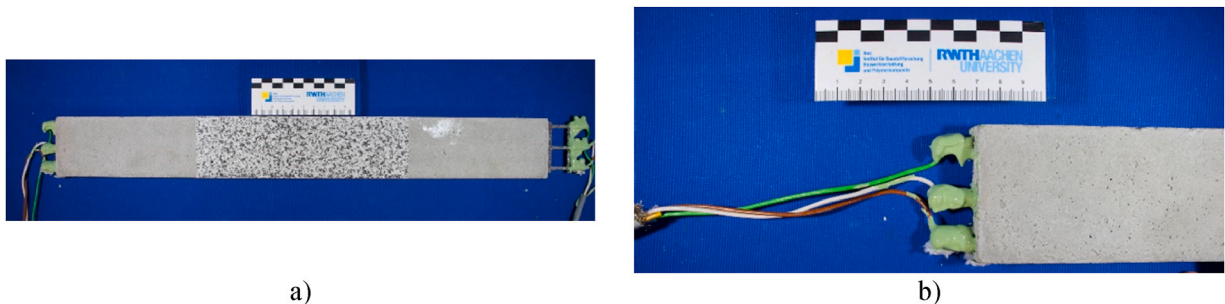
Tensile specimens: a) CTRC tensile specimen with sprayed stochastic pattern; b) Detail of the connections.
